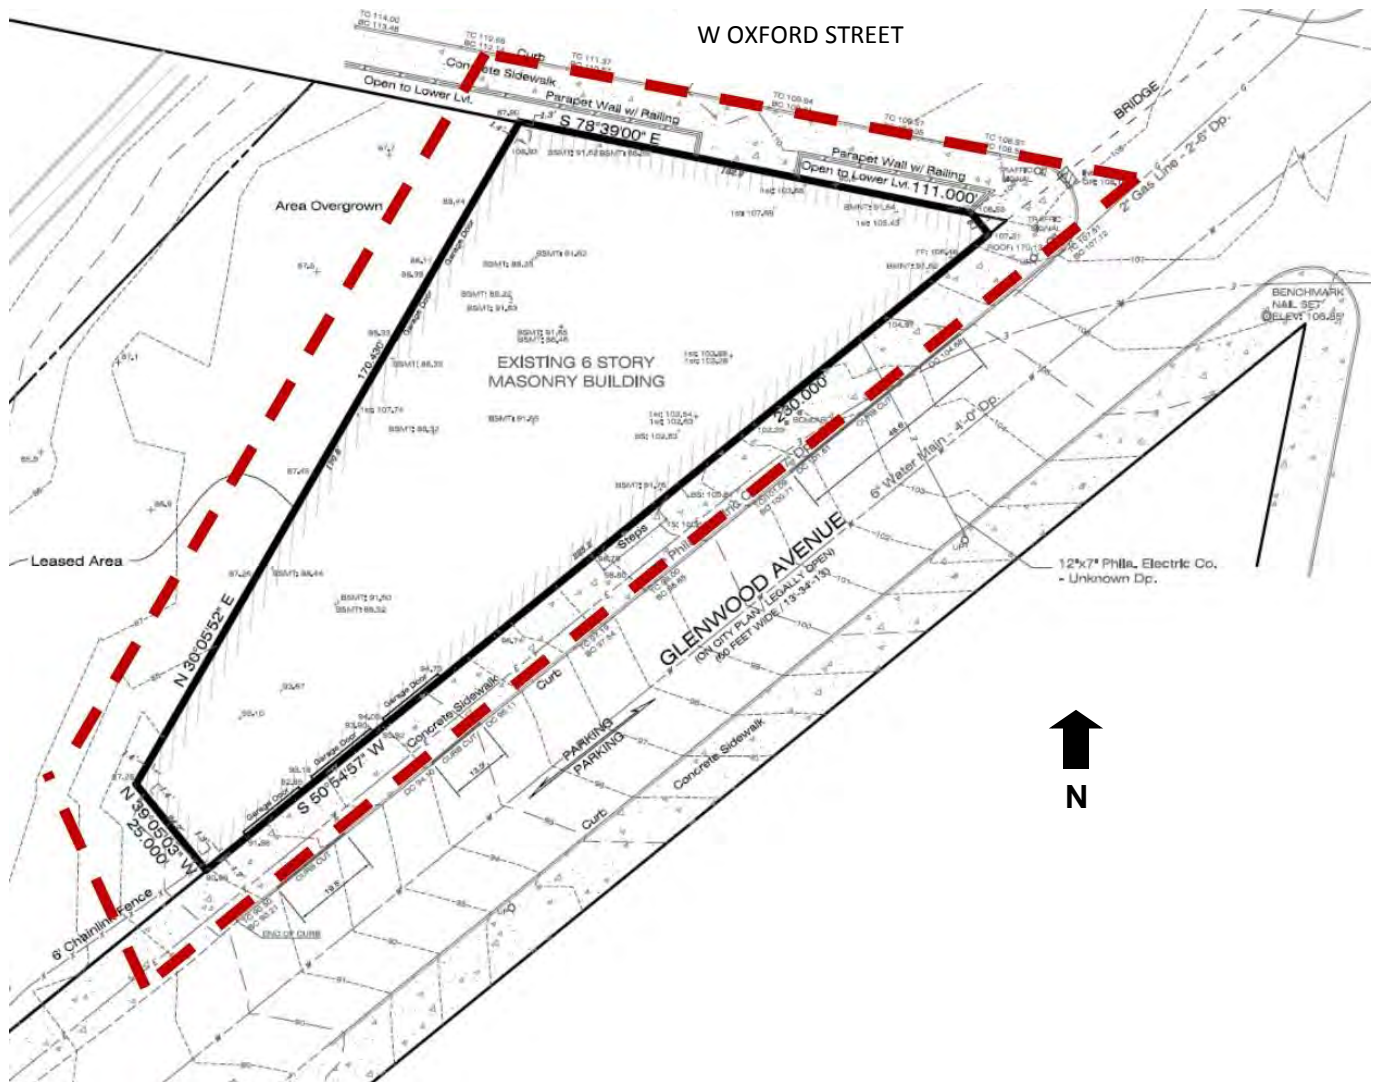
Site plan, showing approximate National Register boundary. Boundary consists of building footprint with additional space to convey entrance approaches, enabling understanding of the movement of goods in and out of the building, by truck or rail, and sidewalks adjacent to building. See Figure 12 for formal boundary.
